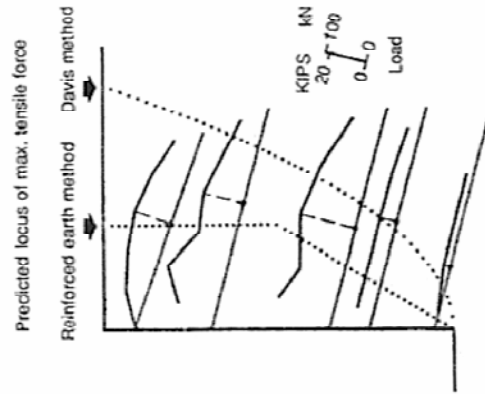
Design, construction and performance of a soil-nailed wall in Seattle, Washington—load distribution on nails.<sup>69</sup>
